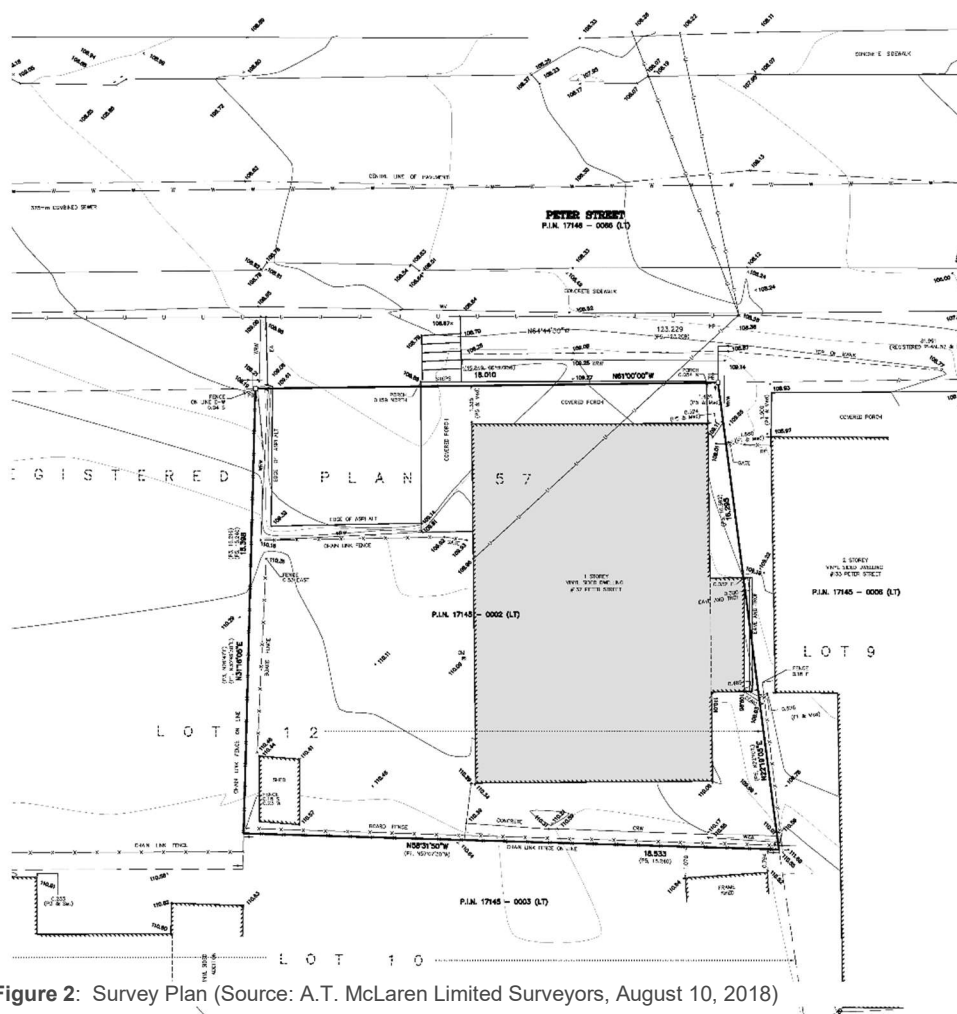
Survey Plan (Source: A.T. McLaren Limited Surveyors, August 10, 2018)
